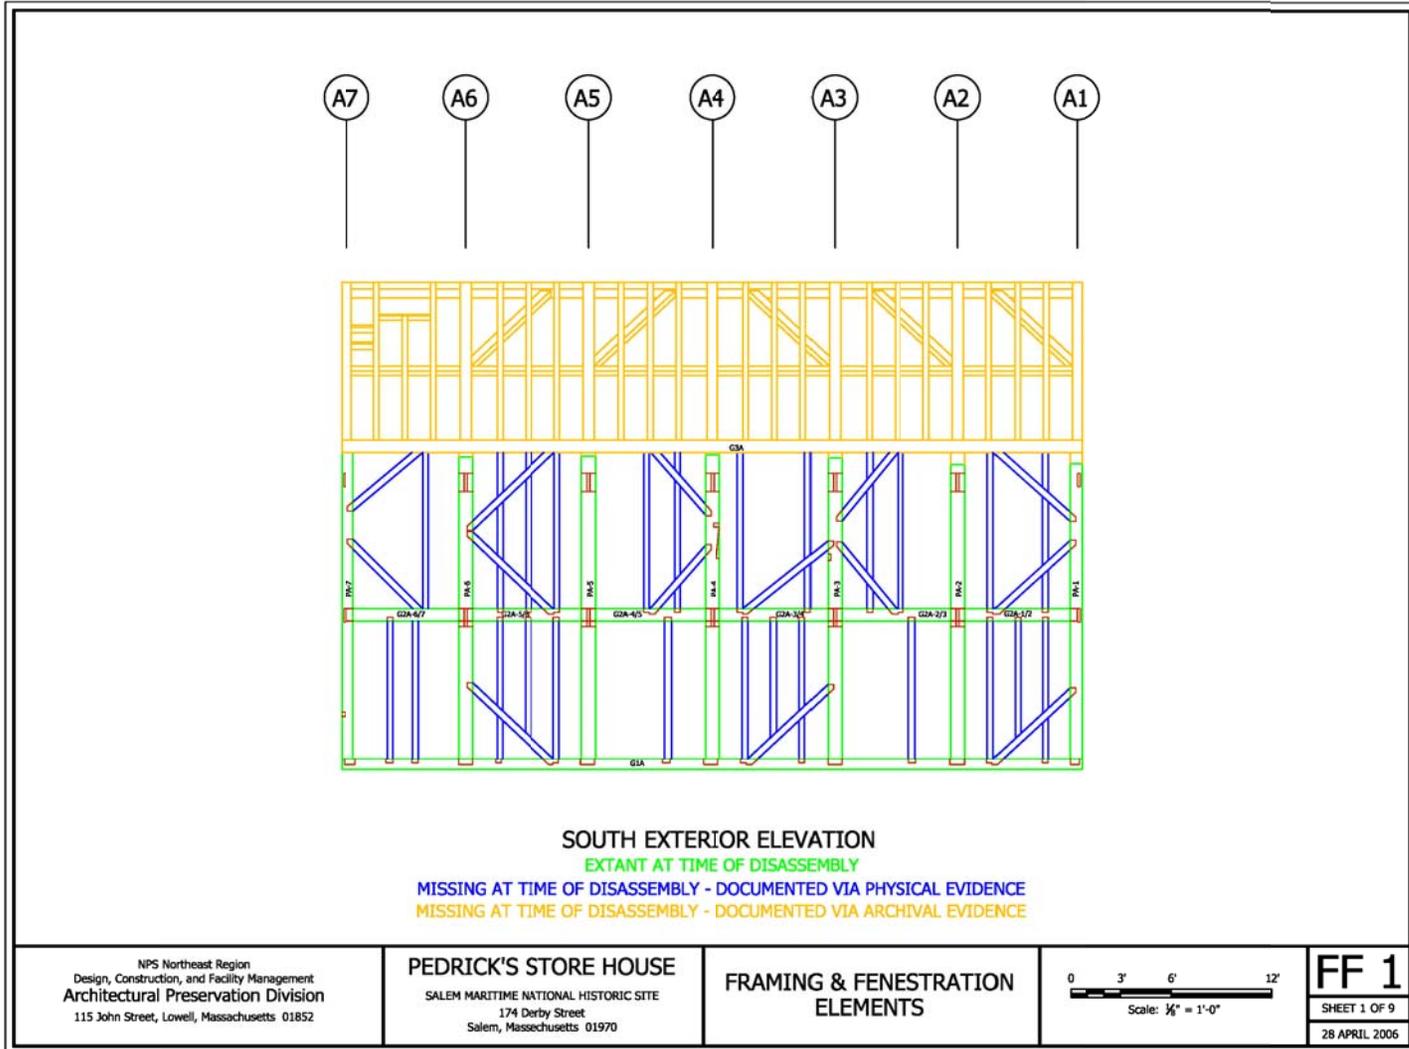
Measured drawing of framing and fenestration elements: South exterior elevation.
